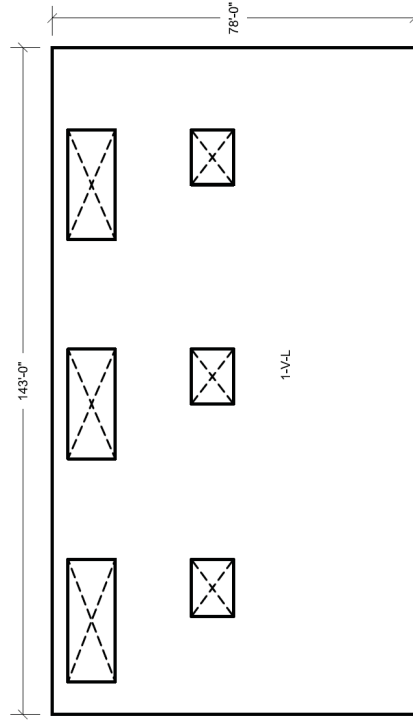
H.6-138A: PUMP HOUSE ROOF
